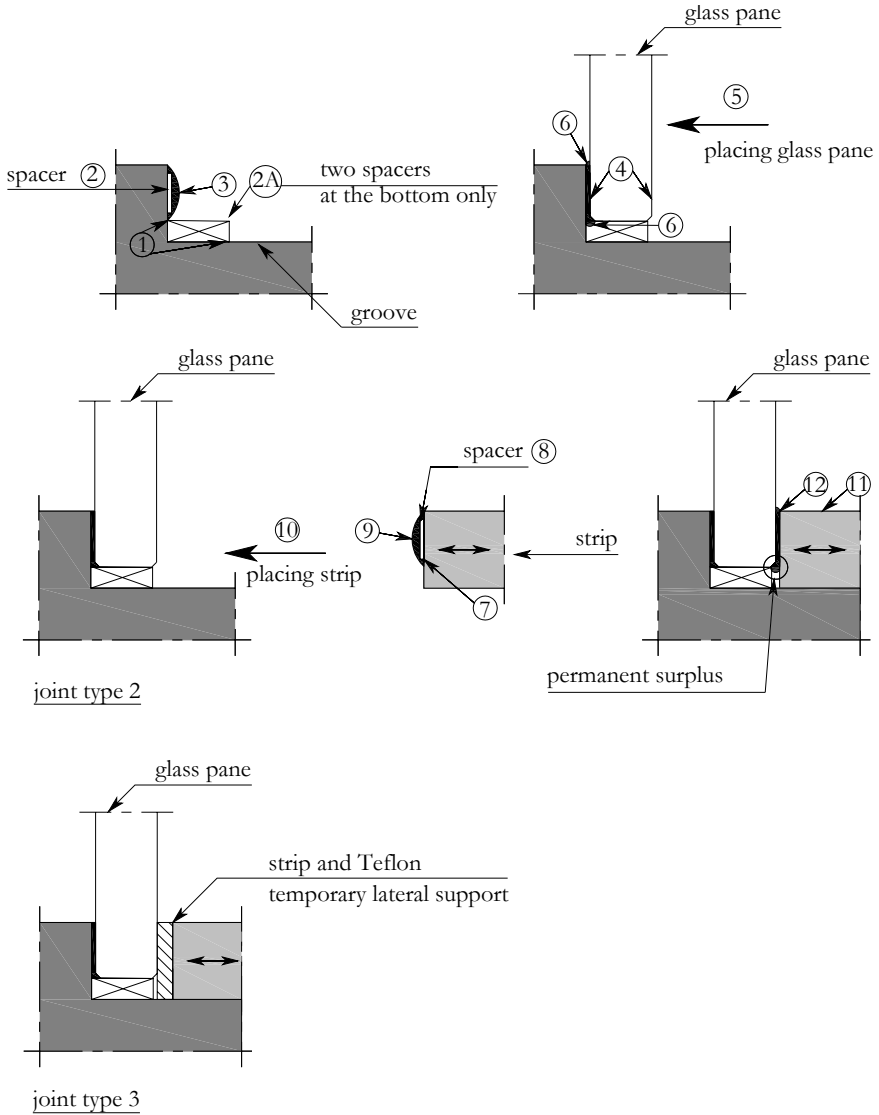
Making the adhesive bonded joint for joint of type 2 and 3 (drawn cross section of the bottom transom)
